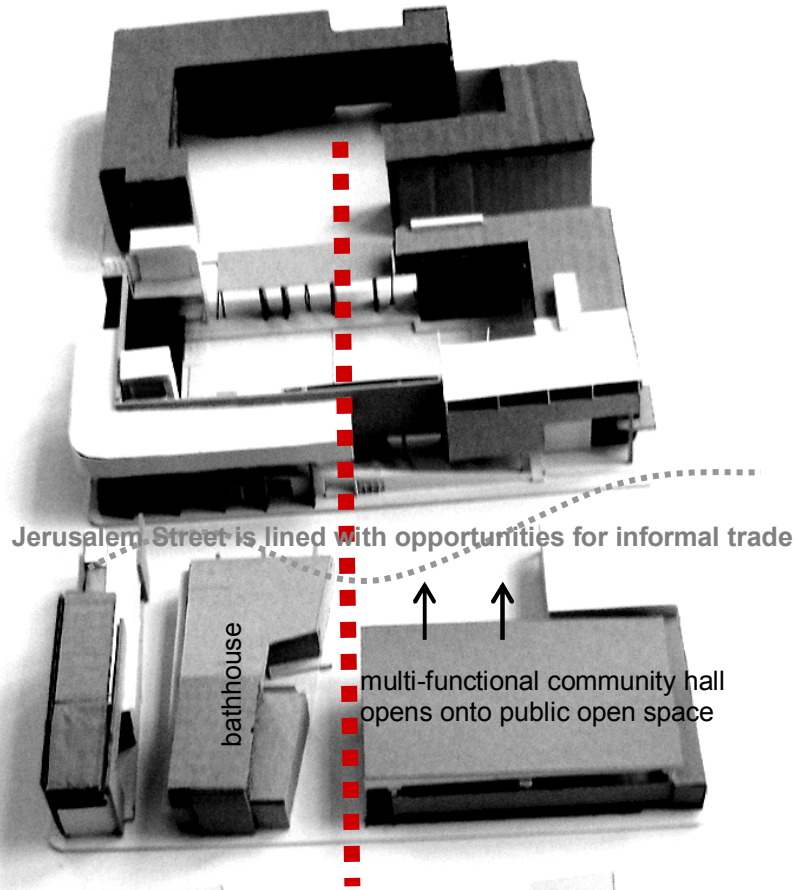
site layout with the bathhouse and community hall situated to the east of Jerusalem Street, ranking facilities are located in the two blocks bordering Fourth Street.
